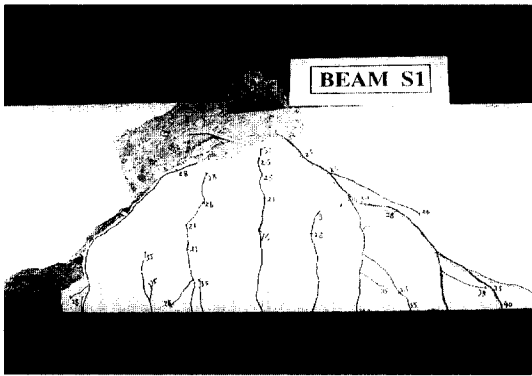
Shear-compression failure and crack pattern of Beam S1
